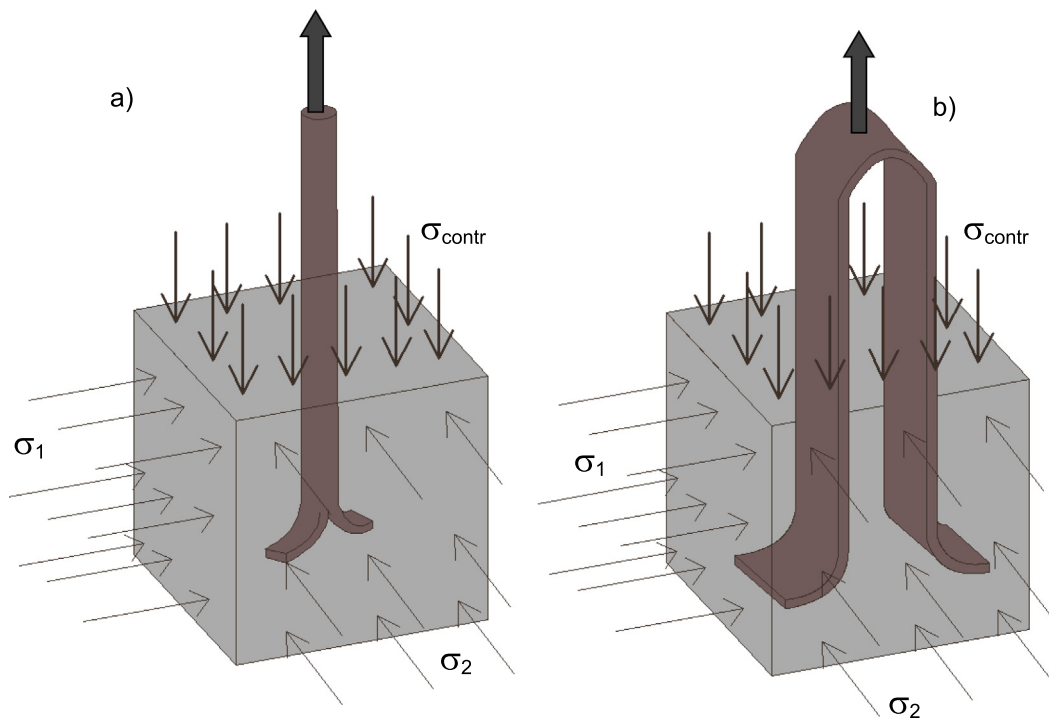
Tested specimens casted in the concrete cube 150x150x150mm.
